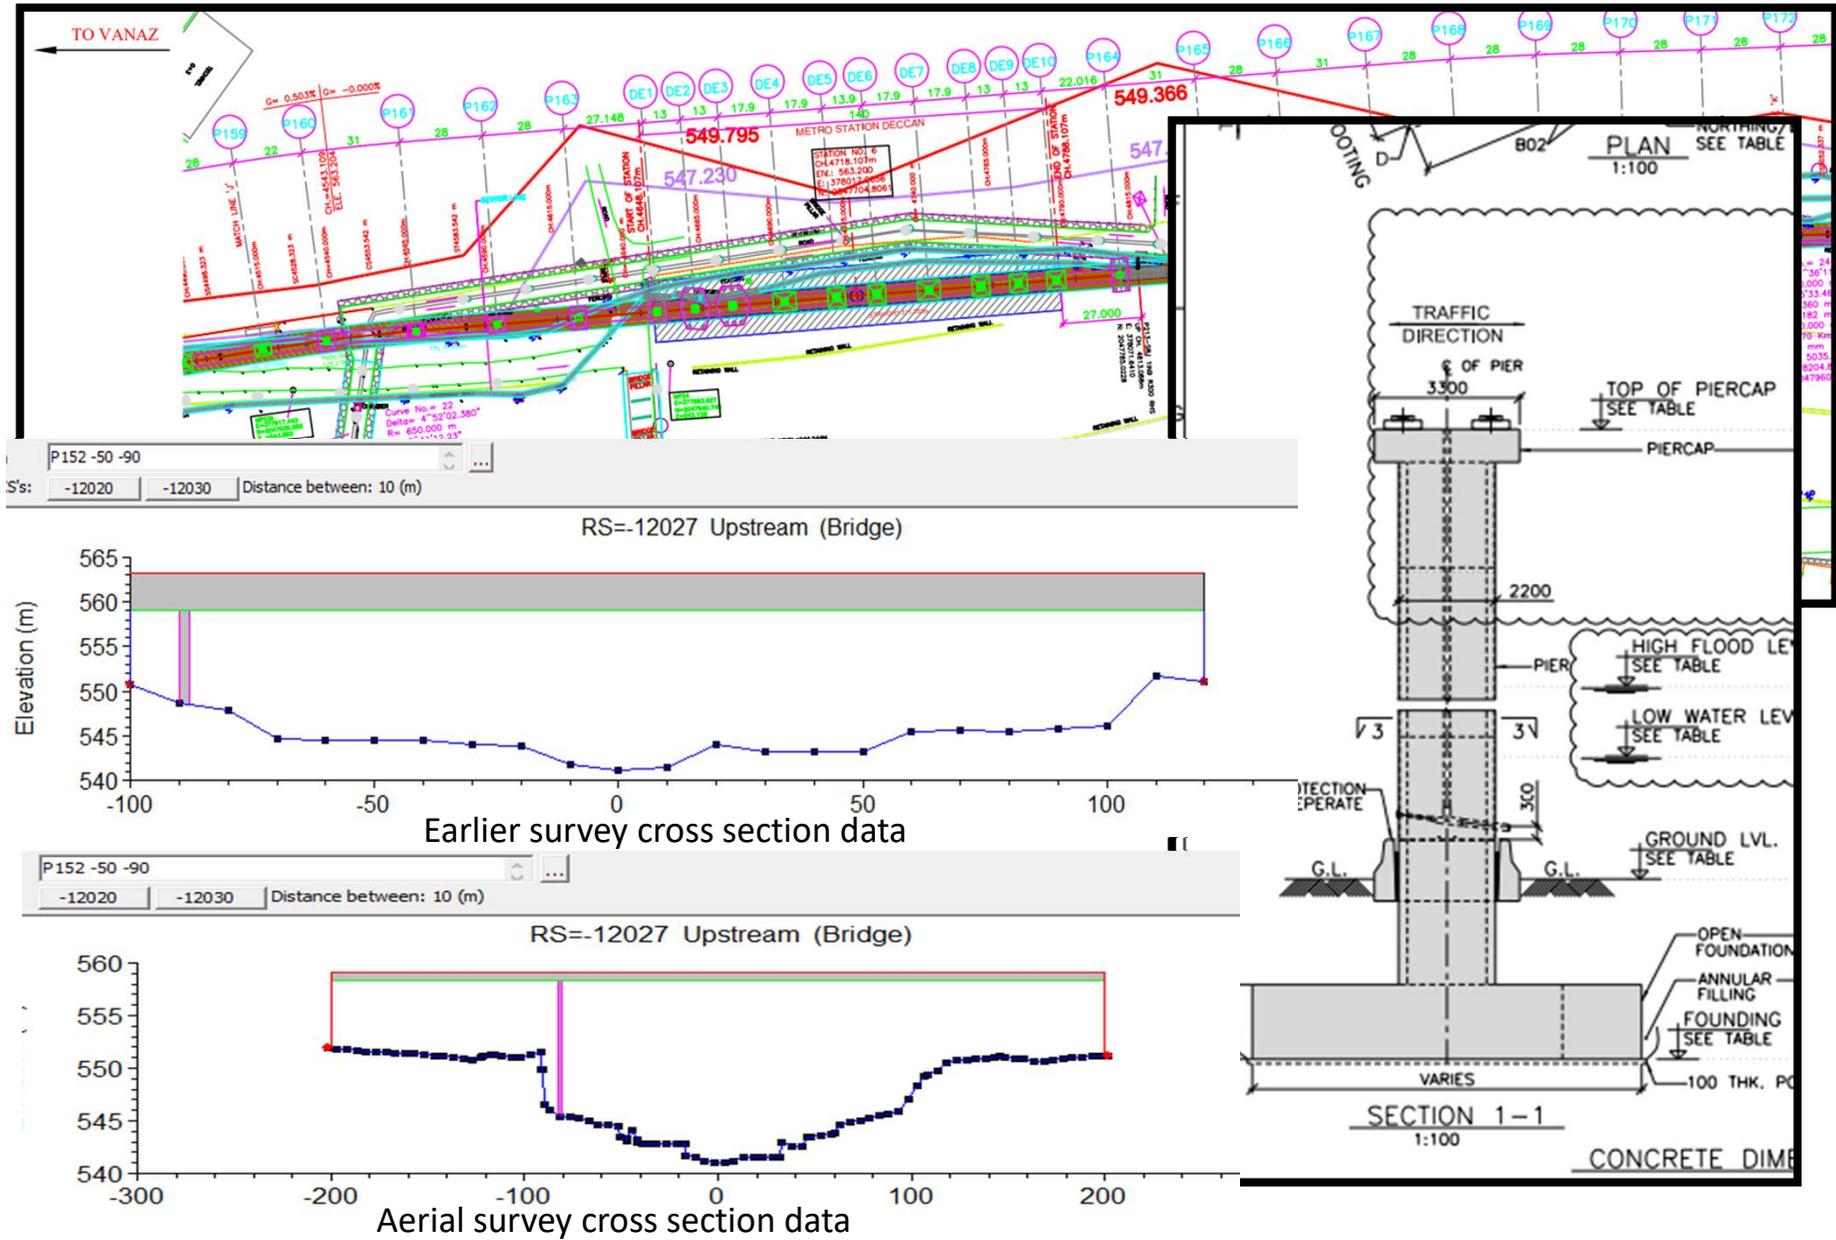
Sample Data Metro pier (P152) near Sambhaji Bridge
